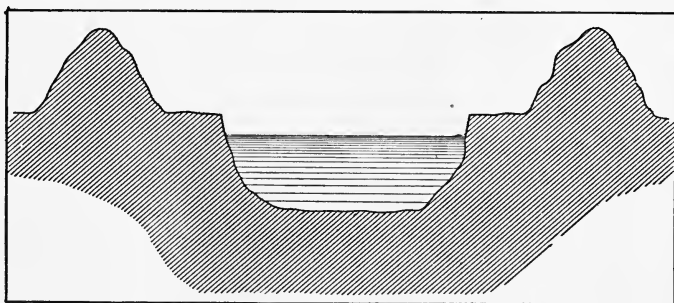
Cross-section of ditch excavated with floating dipper dredge.
